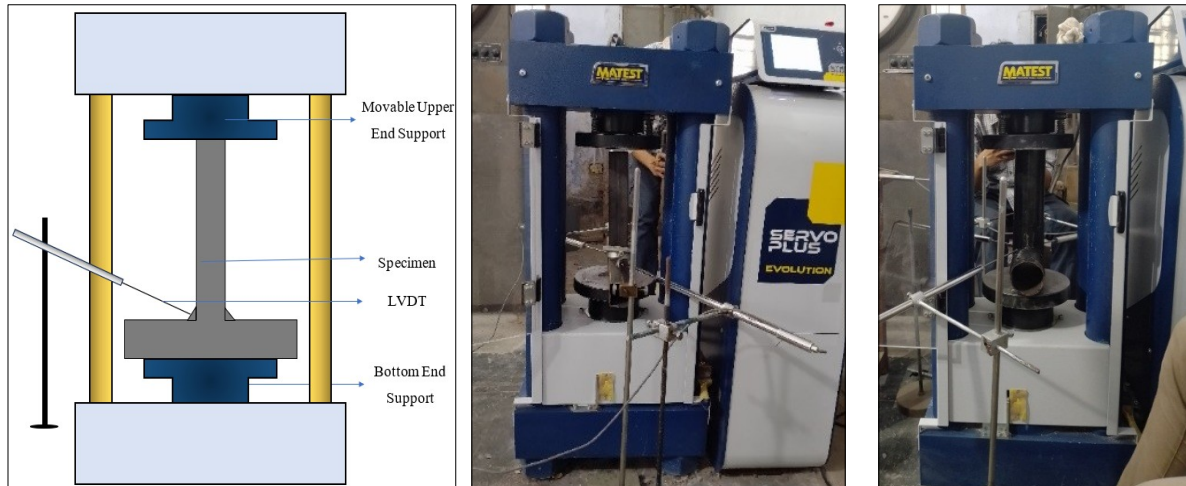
Schematic view of test setup and test arrangement of the tubular steel section T-joints.
